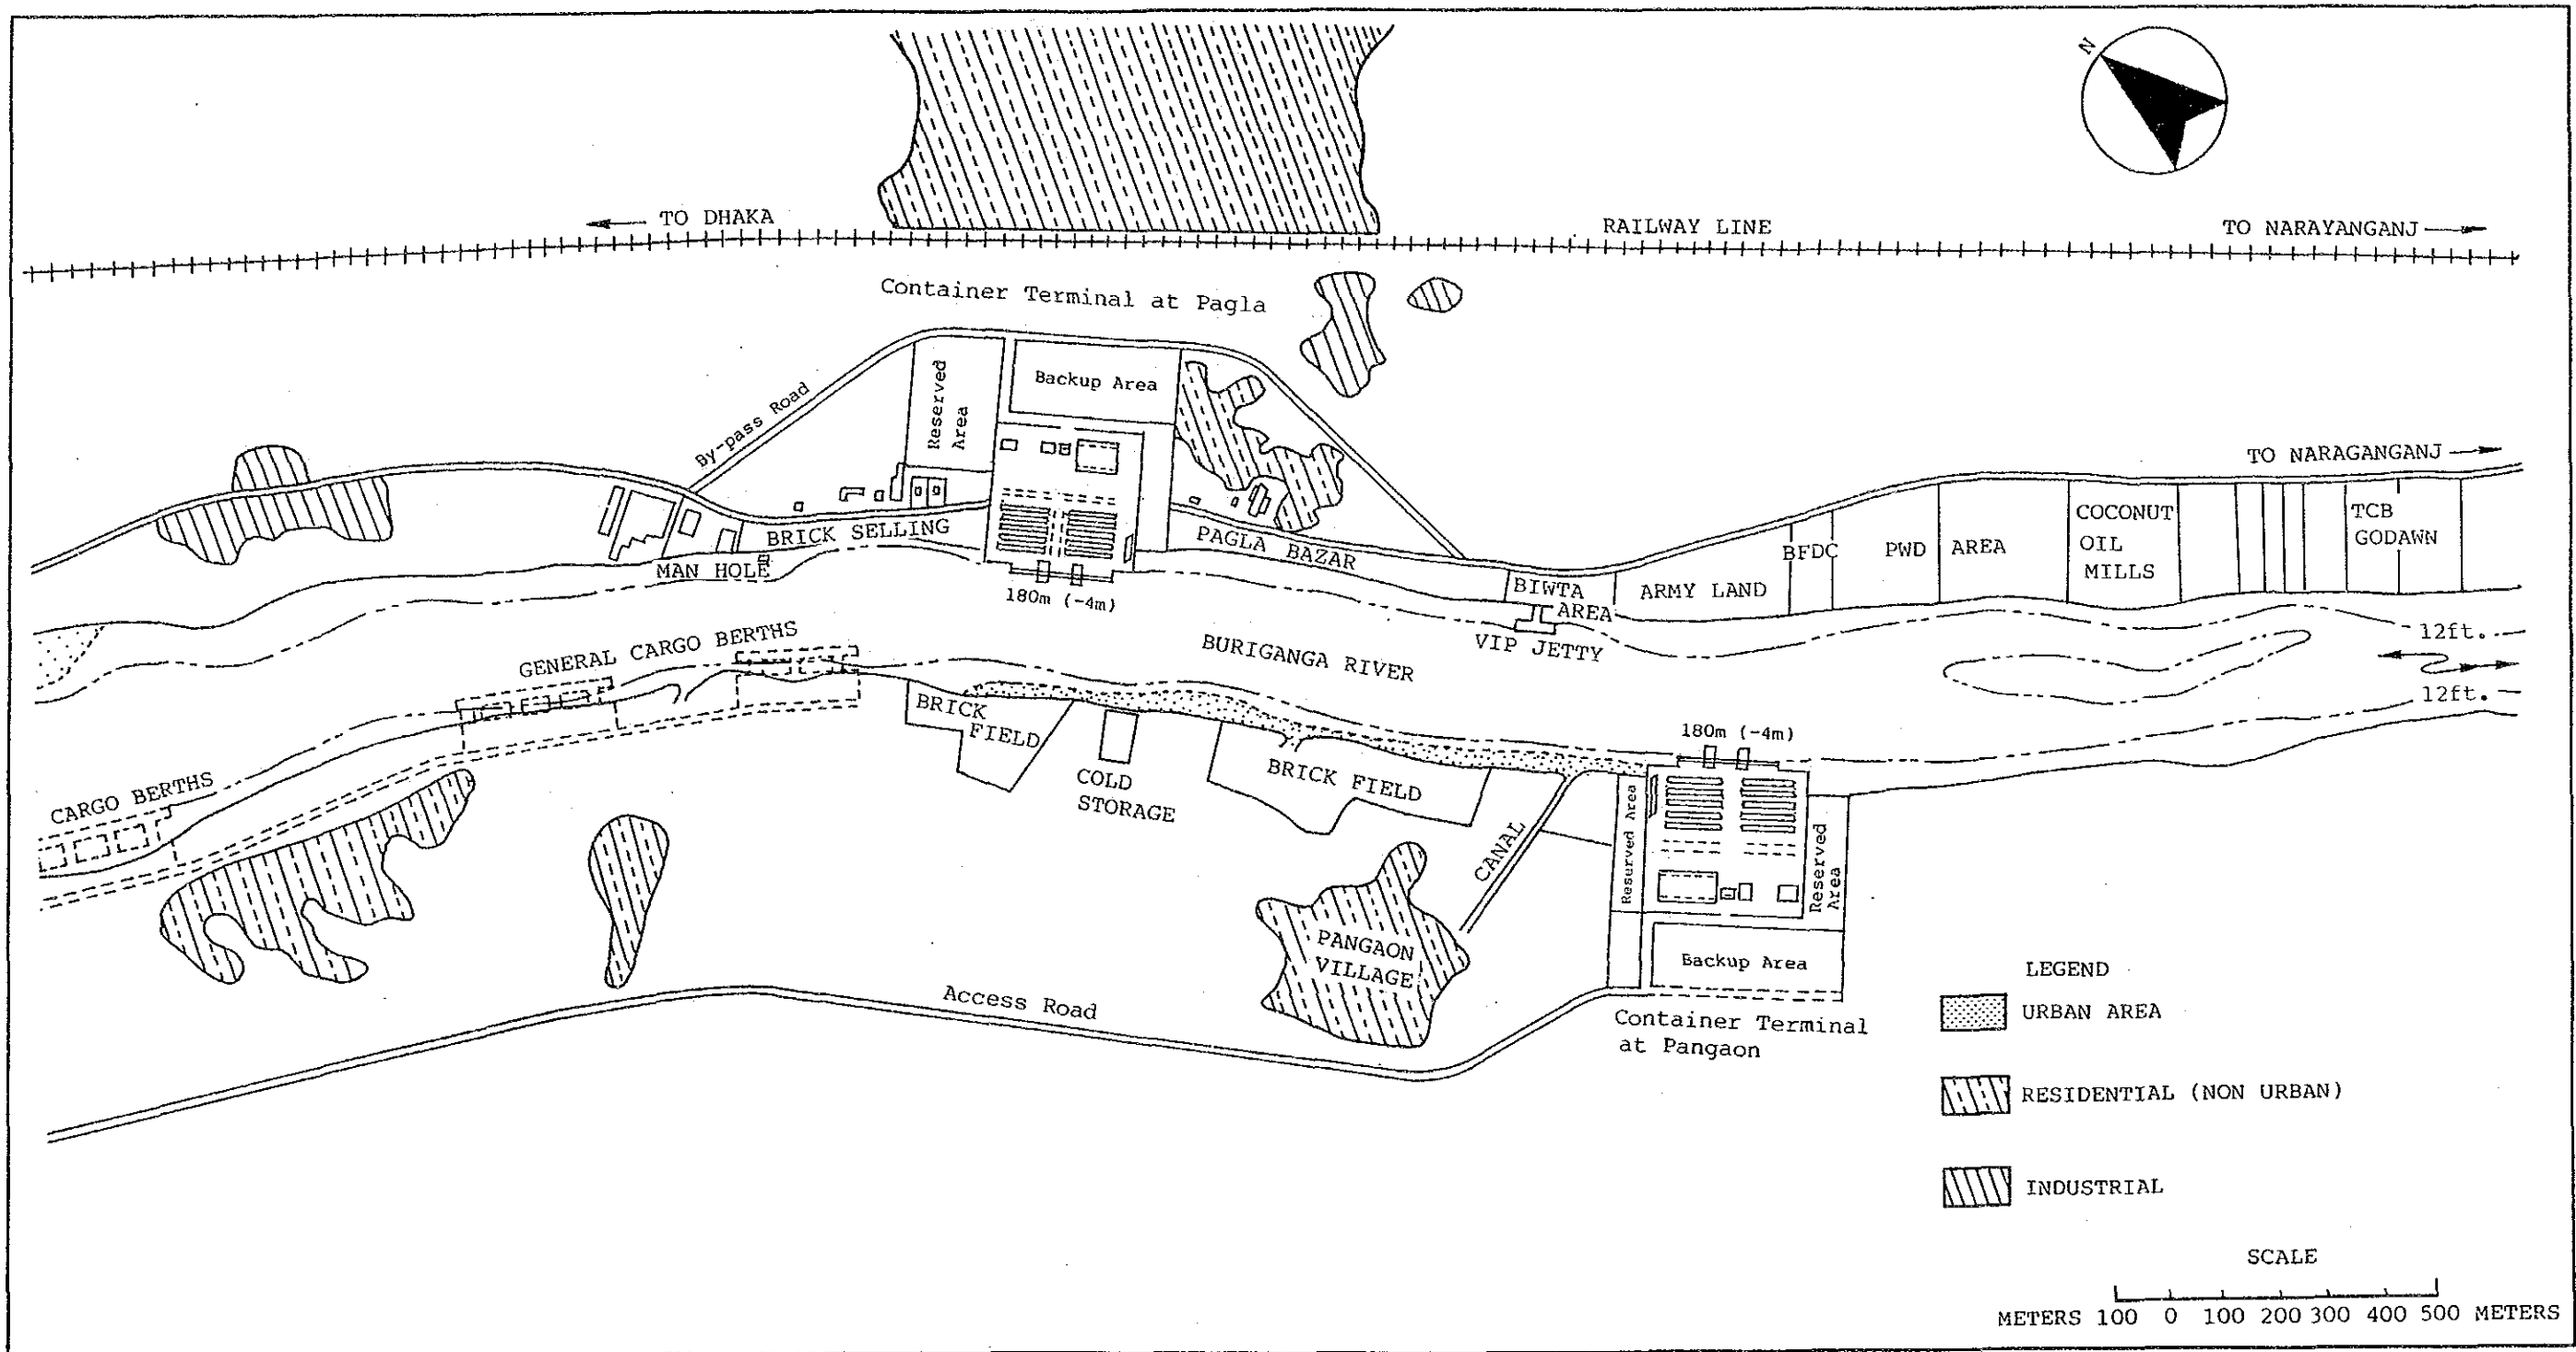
Alternative Development Plan at Pangaon and Pagla Site - Case 4
